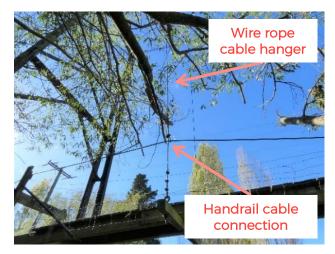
Typical wire rope cable hanger with handrail cable connection
